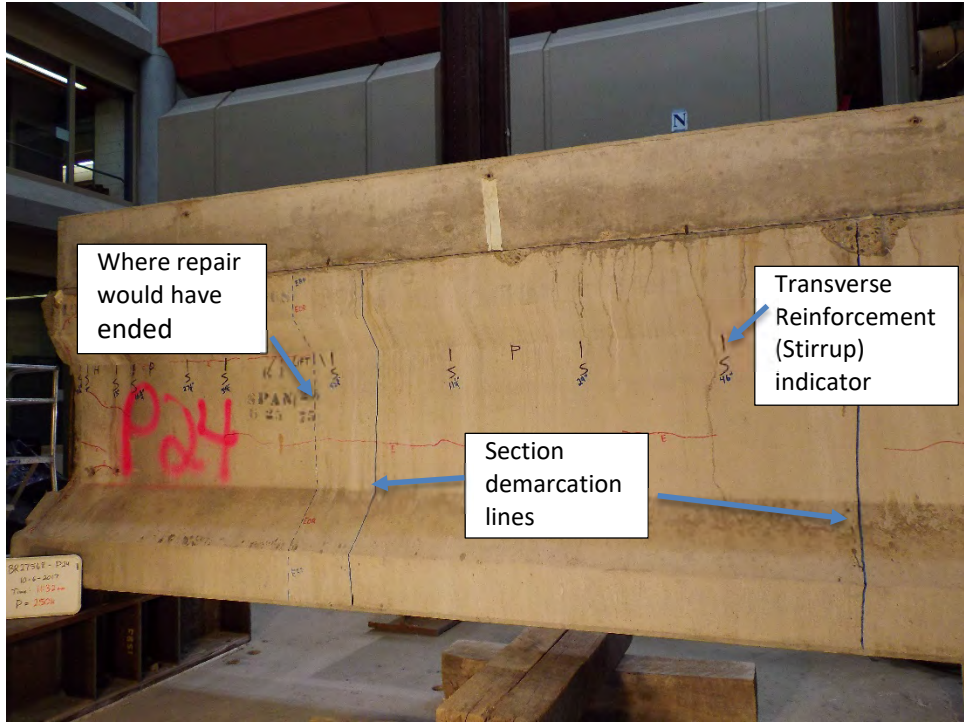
Girder P24 prior to testing showing solid blue lines dividing the girder into sections, a dashed blue line in the end section indicating where the repair ended on Girder P26, and the location of the transverse reinforcement
